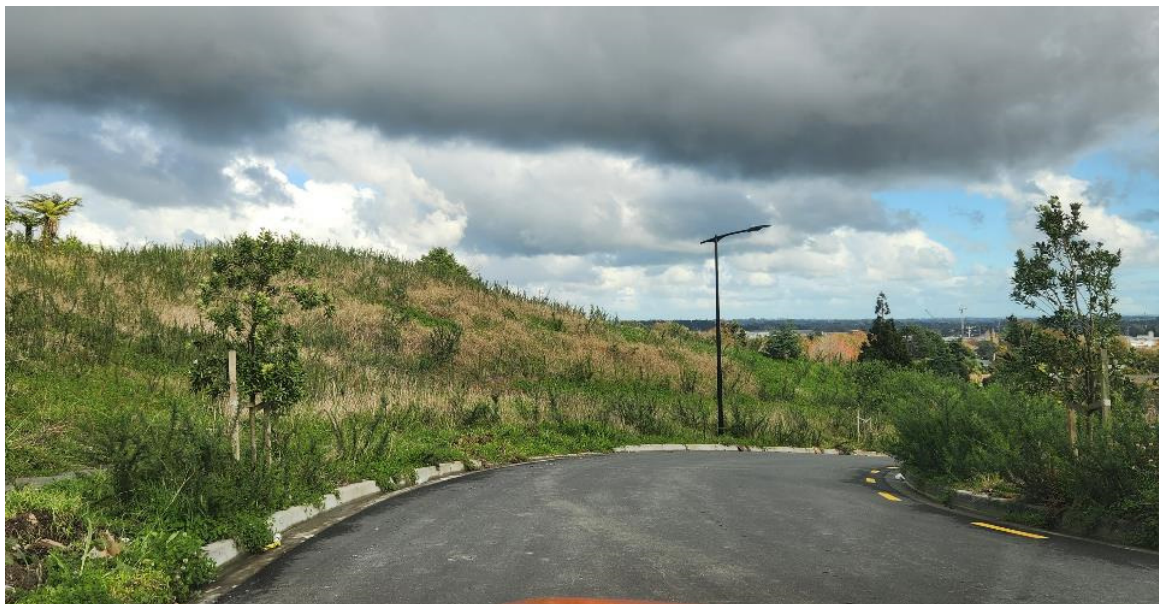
and 2: Sight distance looking west and north along Crestview Rise from the proposed intersection
